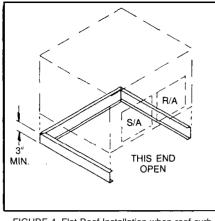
Flat Roof Installation when roof curb is not used. 3" minimum steel rails.
